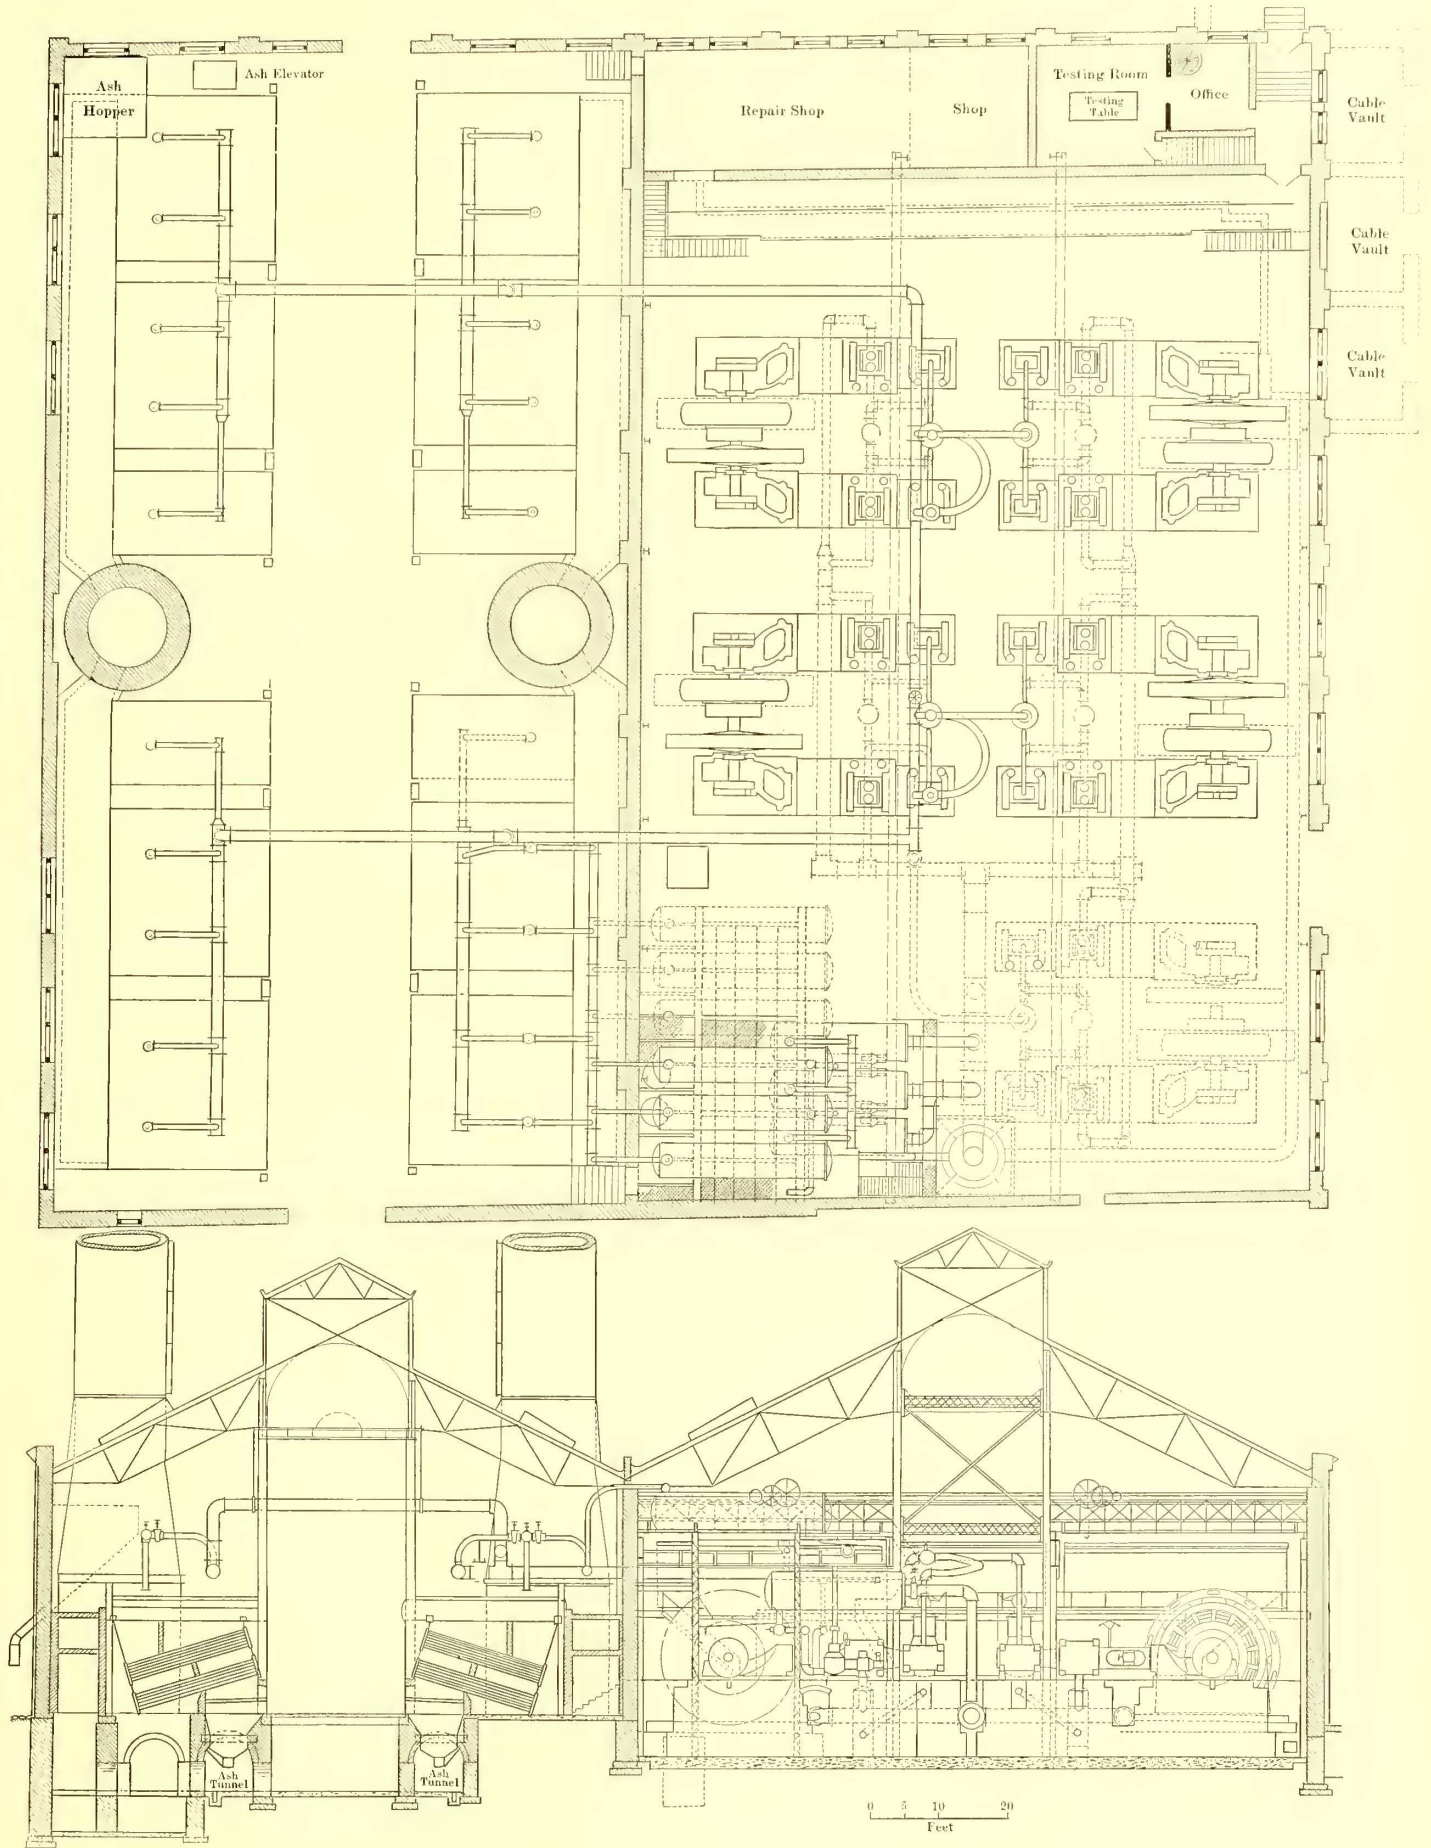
PLAN AND ELEVATION OF 13TH & MOUNT VERNON STREETS POWER STATION
